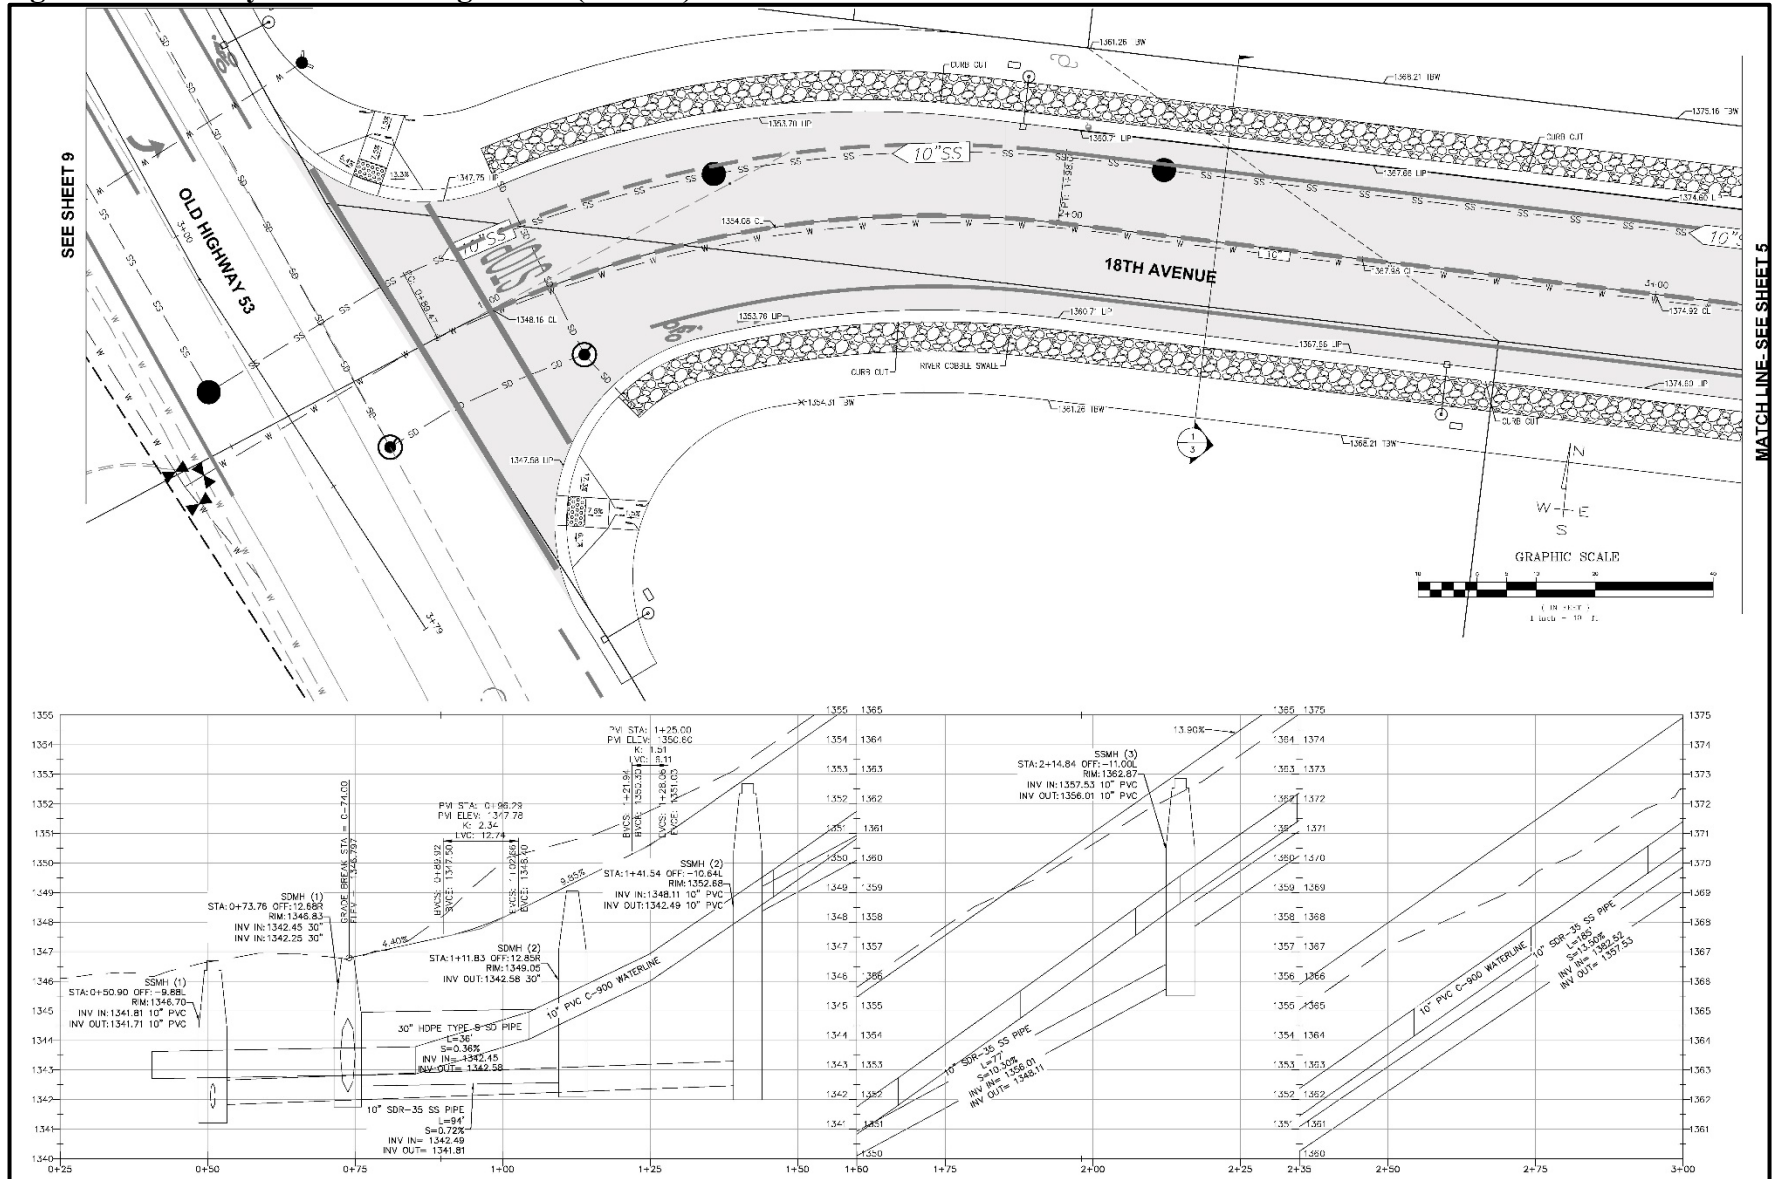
Roadway Site Plan – Segment 2 (Sheet 5)
